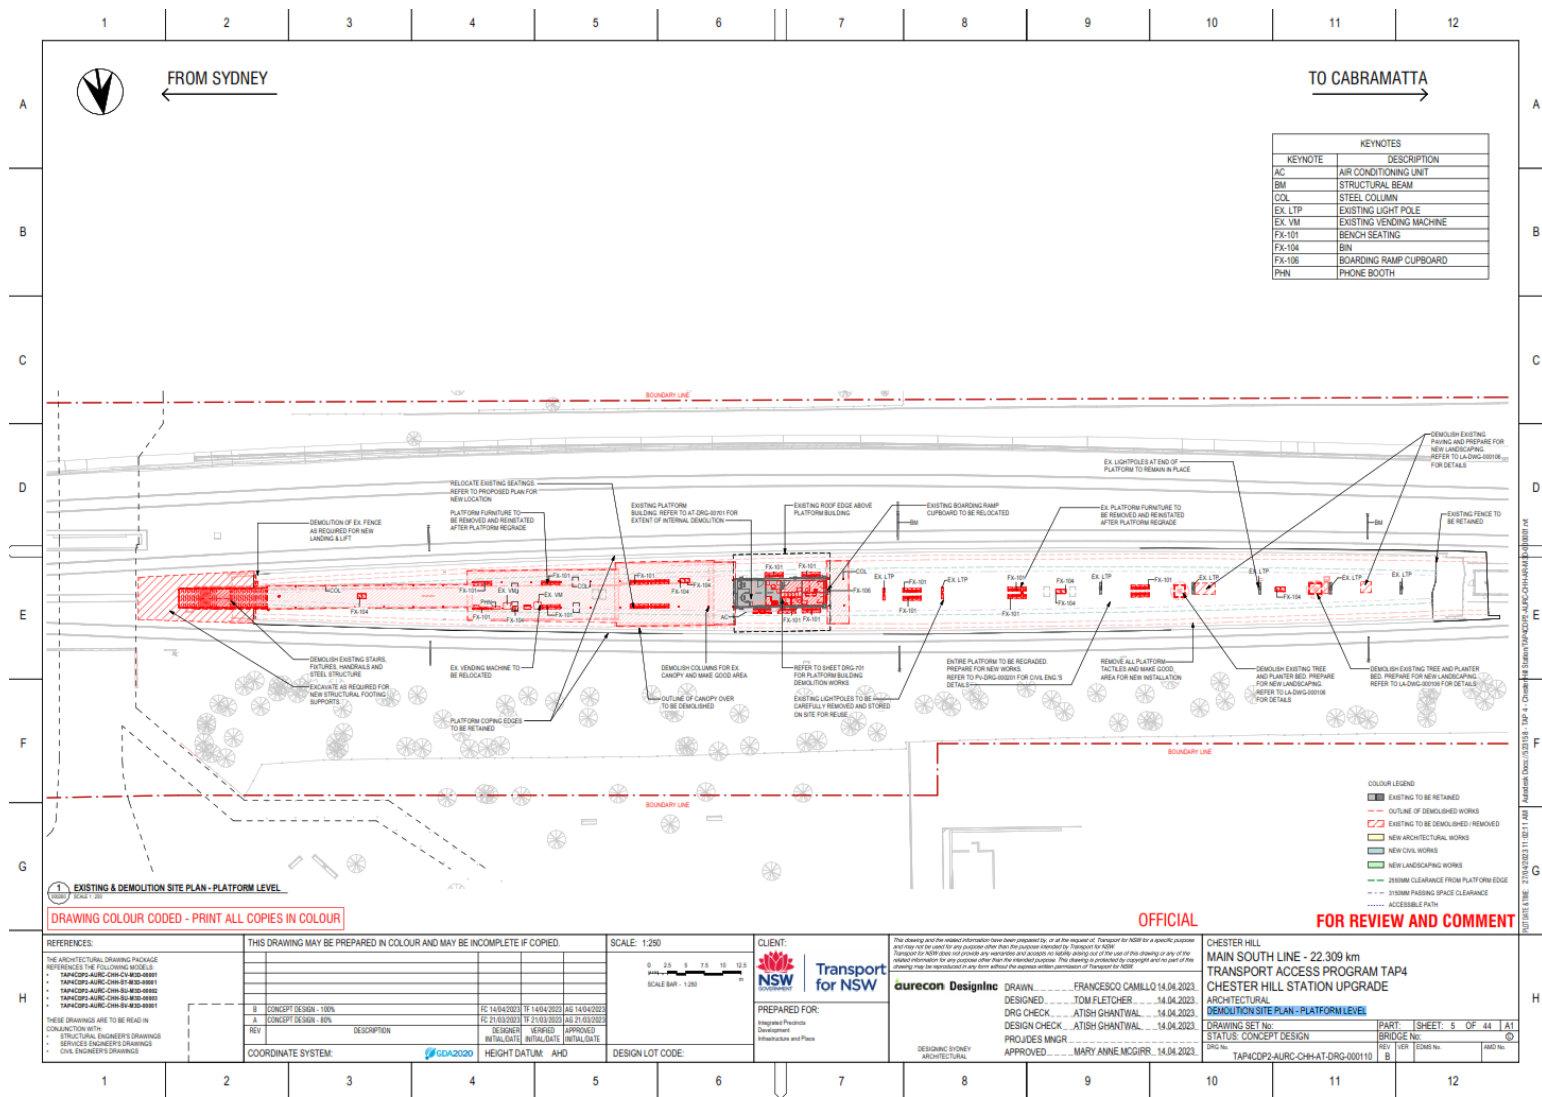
Proposed demolition plan for Chester Hill Station (Source: Aurecon 2024)
